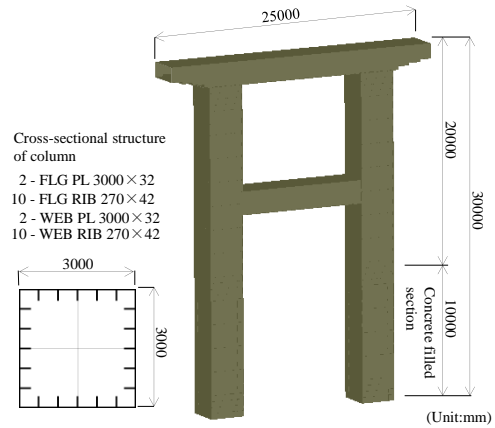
Rectangular cross-section steel Rahmen pier (Conventional Type)
